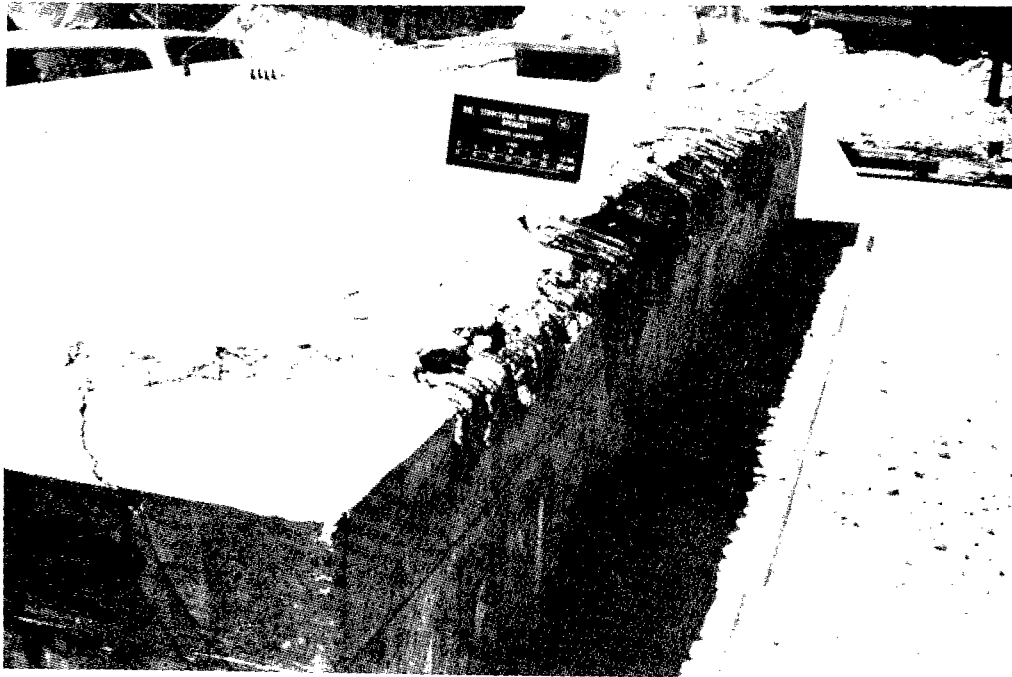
Outside view of damaged roof after Test 2. Note damage at edge of roof and crack in concrete at corner
